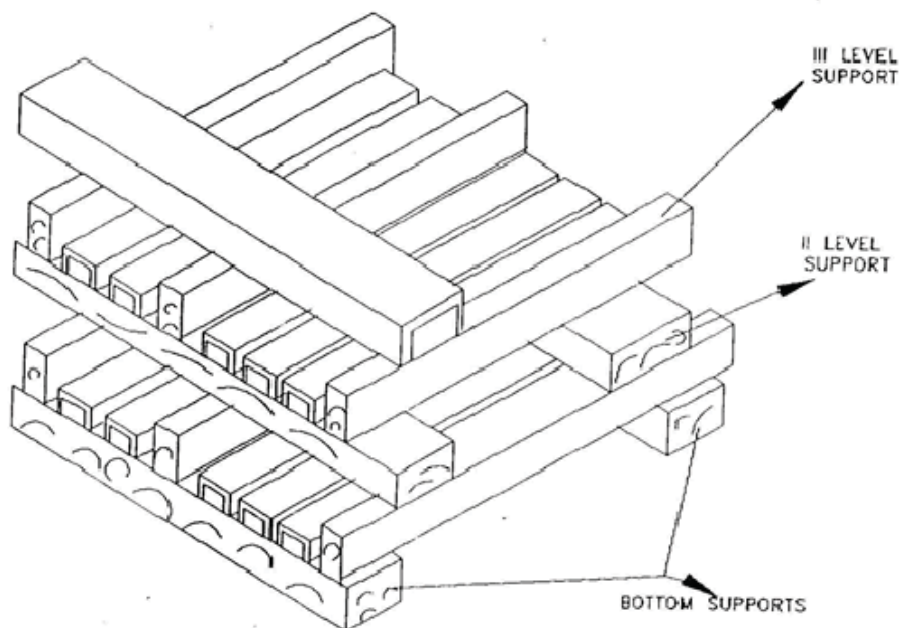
STRUCTURAL STEEL STACKING ARRANGEMENT
